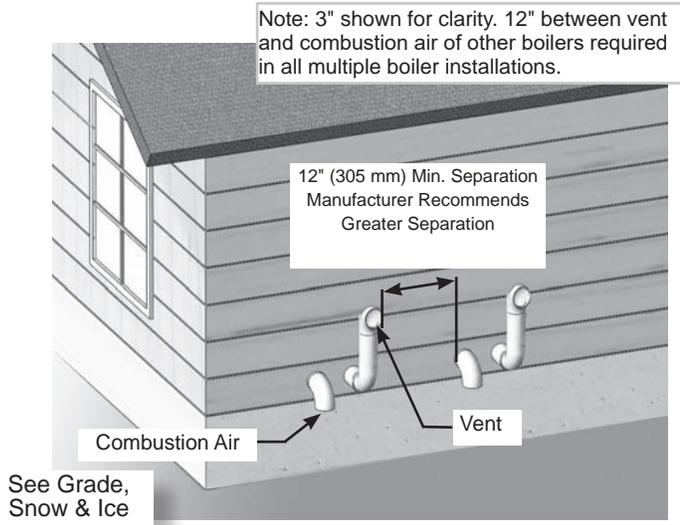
Horizontal Twin Pipe, Exhaust and Intake
